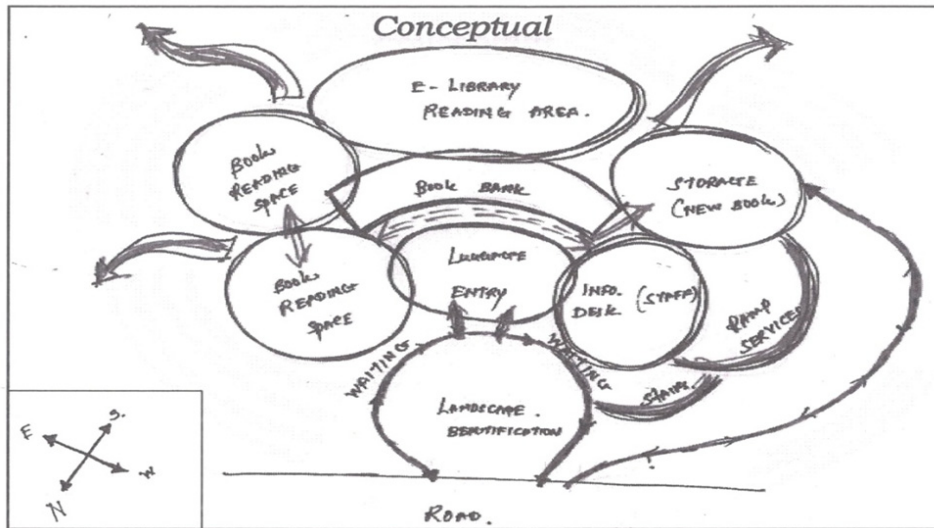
Conceptual Plan of New Library Building at SVNIT Surat
